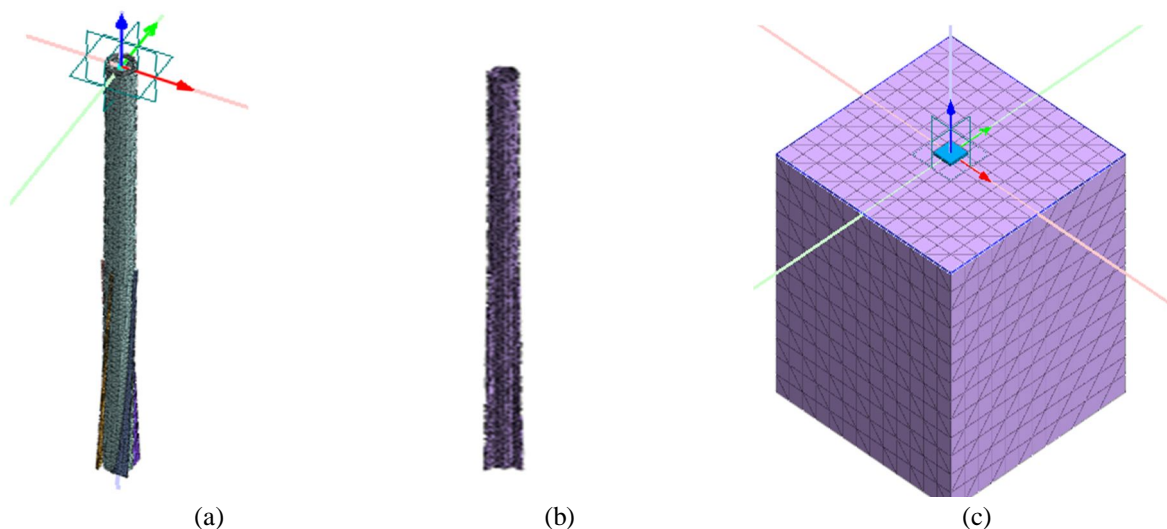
a) Three Dimensional View of inclined trapezoidal Spin Fin Pile, b) Three Dimensional View of straight trapezoidal Spin Fin Pile and c) Sand Block
